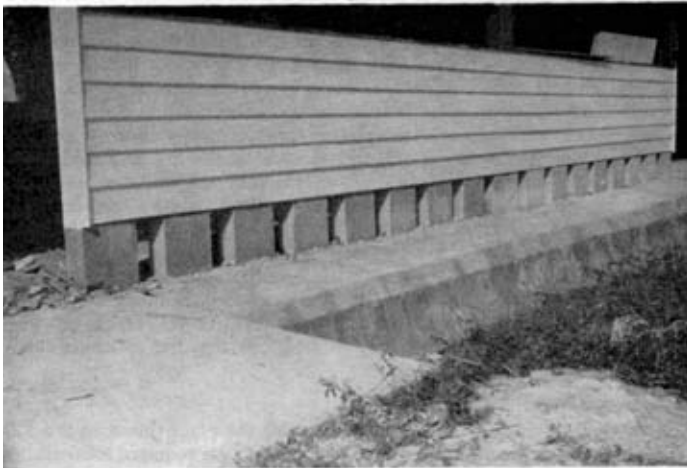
An example of anti-white ant construction. Timber work carried on concrete blocks.
